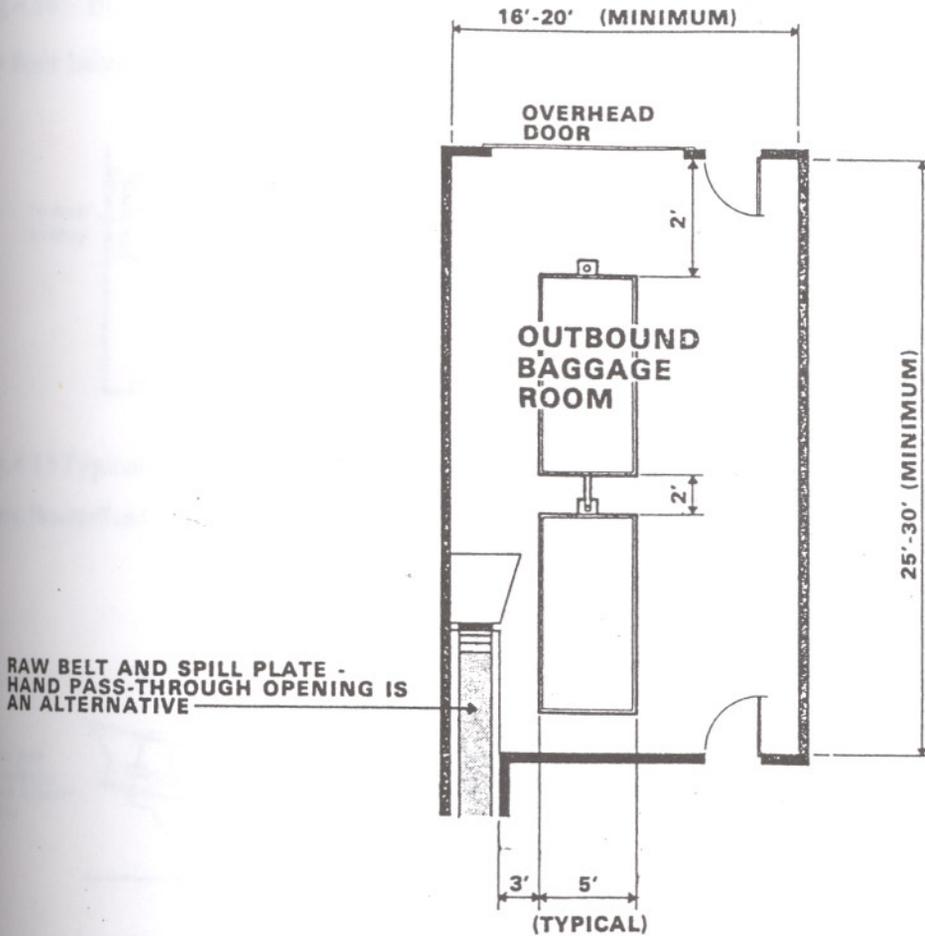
Outbound baggage room typical raw belt conveyor installation
